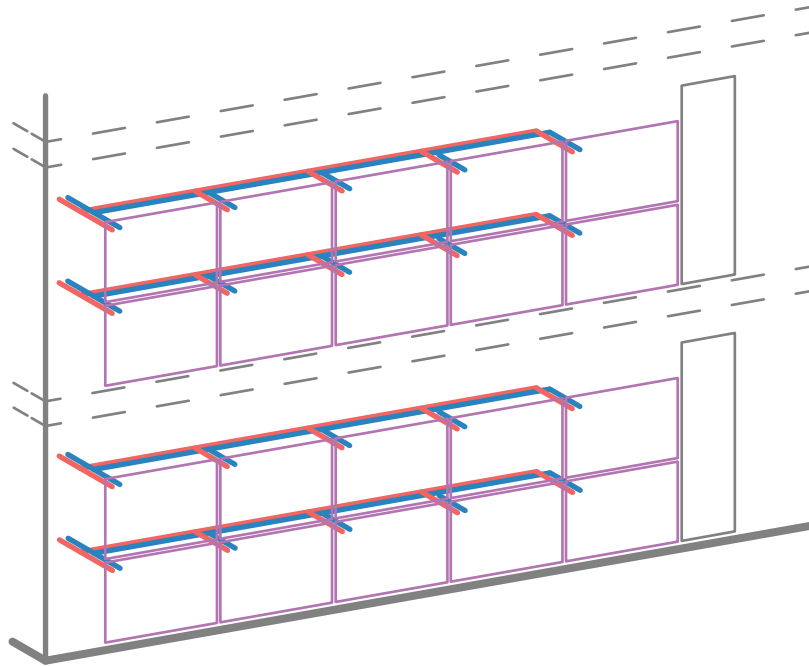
Proposed indoor piping system for horizontally arranged facade-integrated PVT collectors (own illustration).
